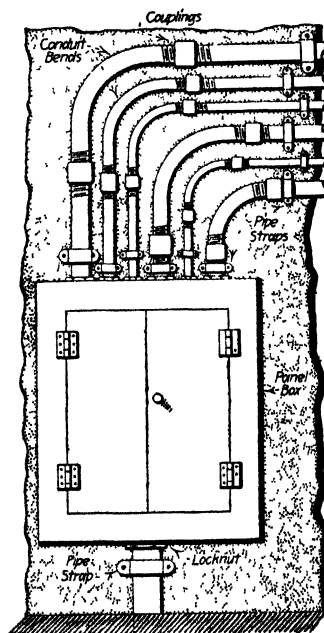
Showing a right-angle turn made in a conduit run with conduit elbows.
